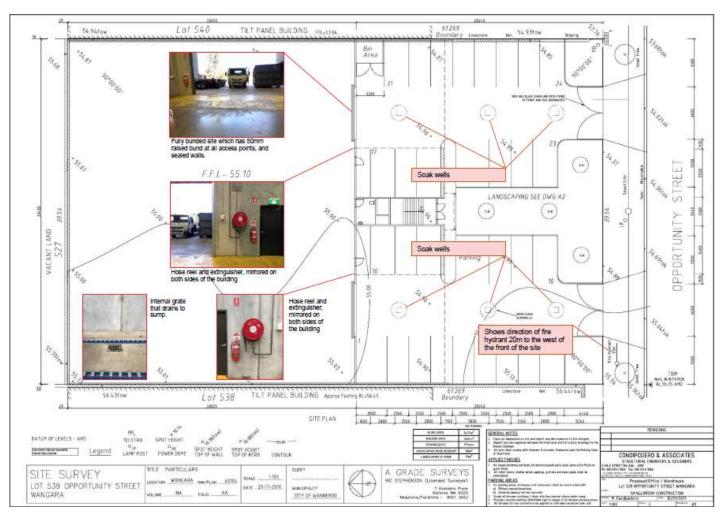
Site Layout Plan showing firefighting equipment and Fire-Fighting washwater containment infrastructure
